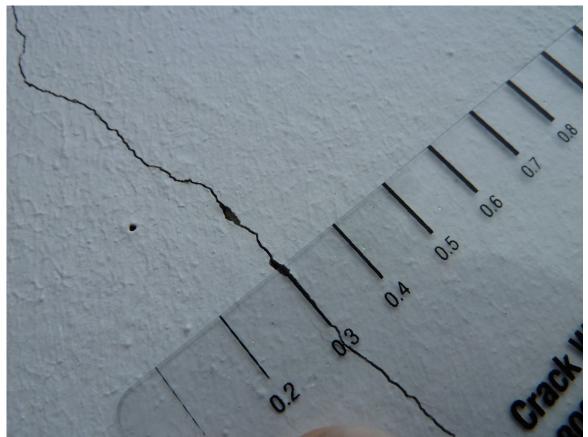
Diagonal crack approximately 0.3mm wide on the west exterior panel
